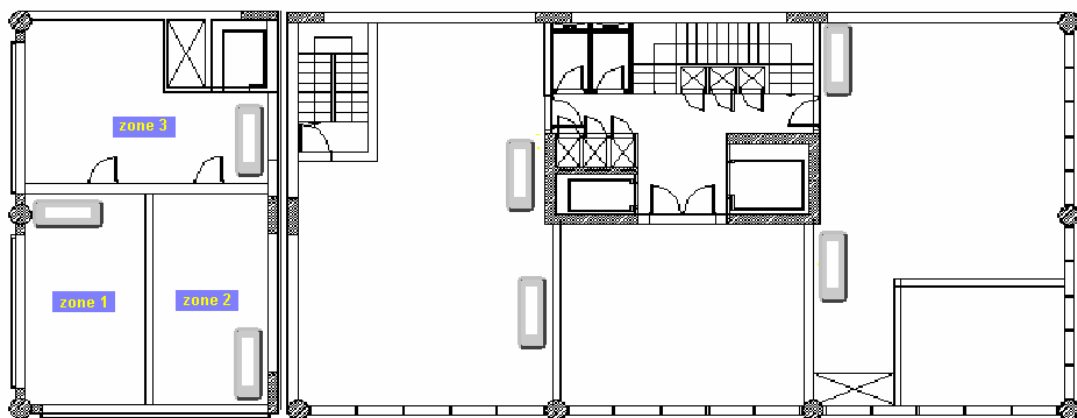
Mezzanine and thermal zones plan of BYTE.
